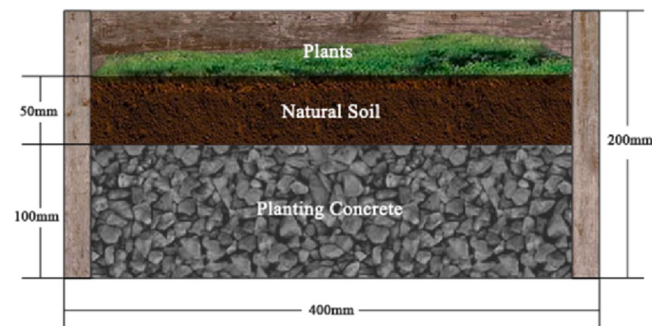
Sketch of PC sample used for the vegetation test [13].
